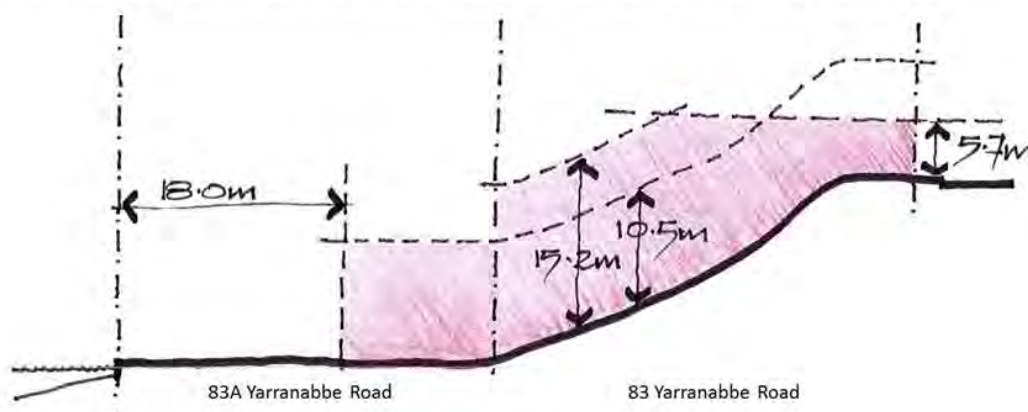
Proposed building envelope for multi dwelling housing or RFB development.
